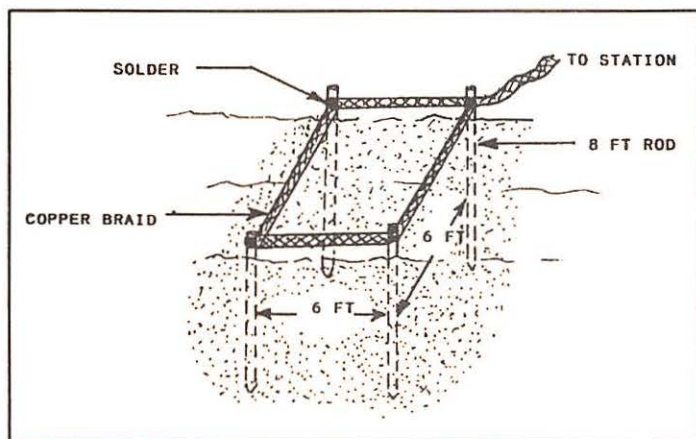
Details for constructing a quality DC earth ground. When it is connected to your station equipment it will protect you from hazardous electrical shocks.
